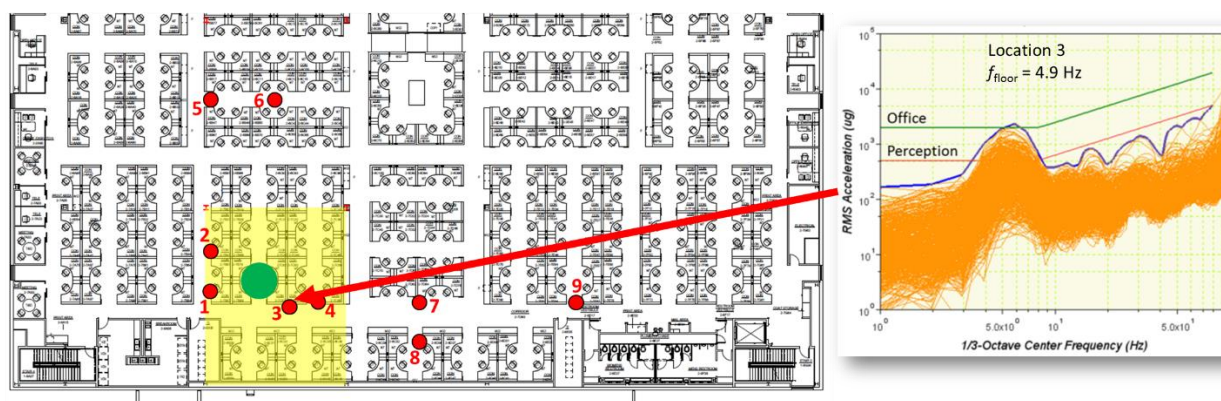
Partial IOC 2nd Floor Plan and Measurement Locations
